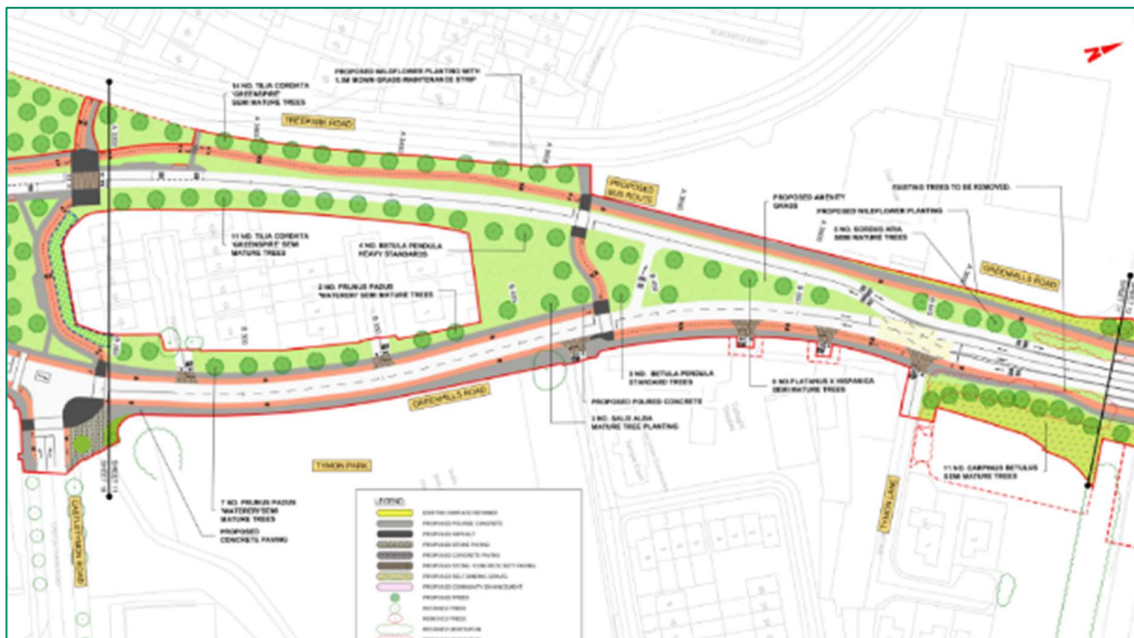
Extract from Landscape General Arrangement Drawing (Sheet 11)
